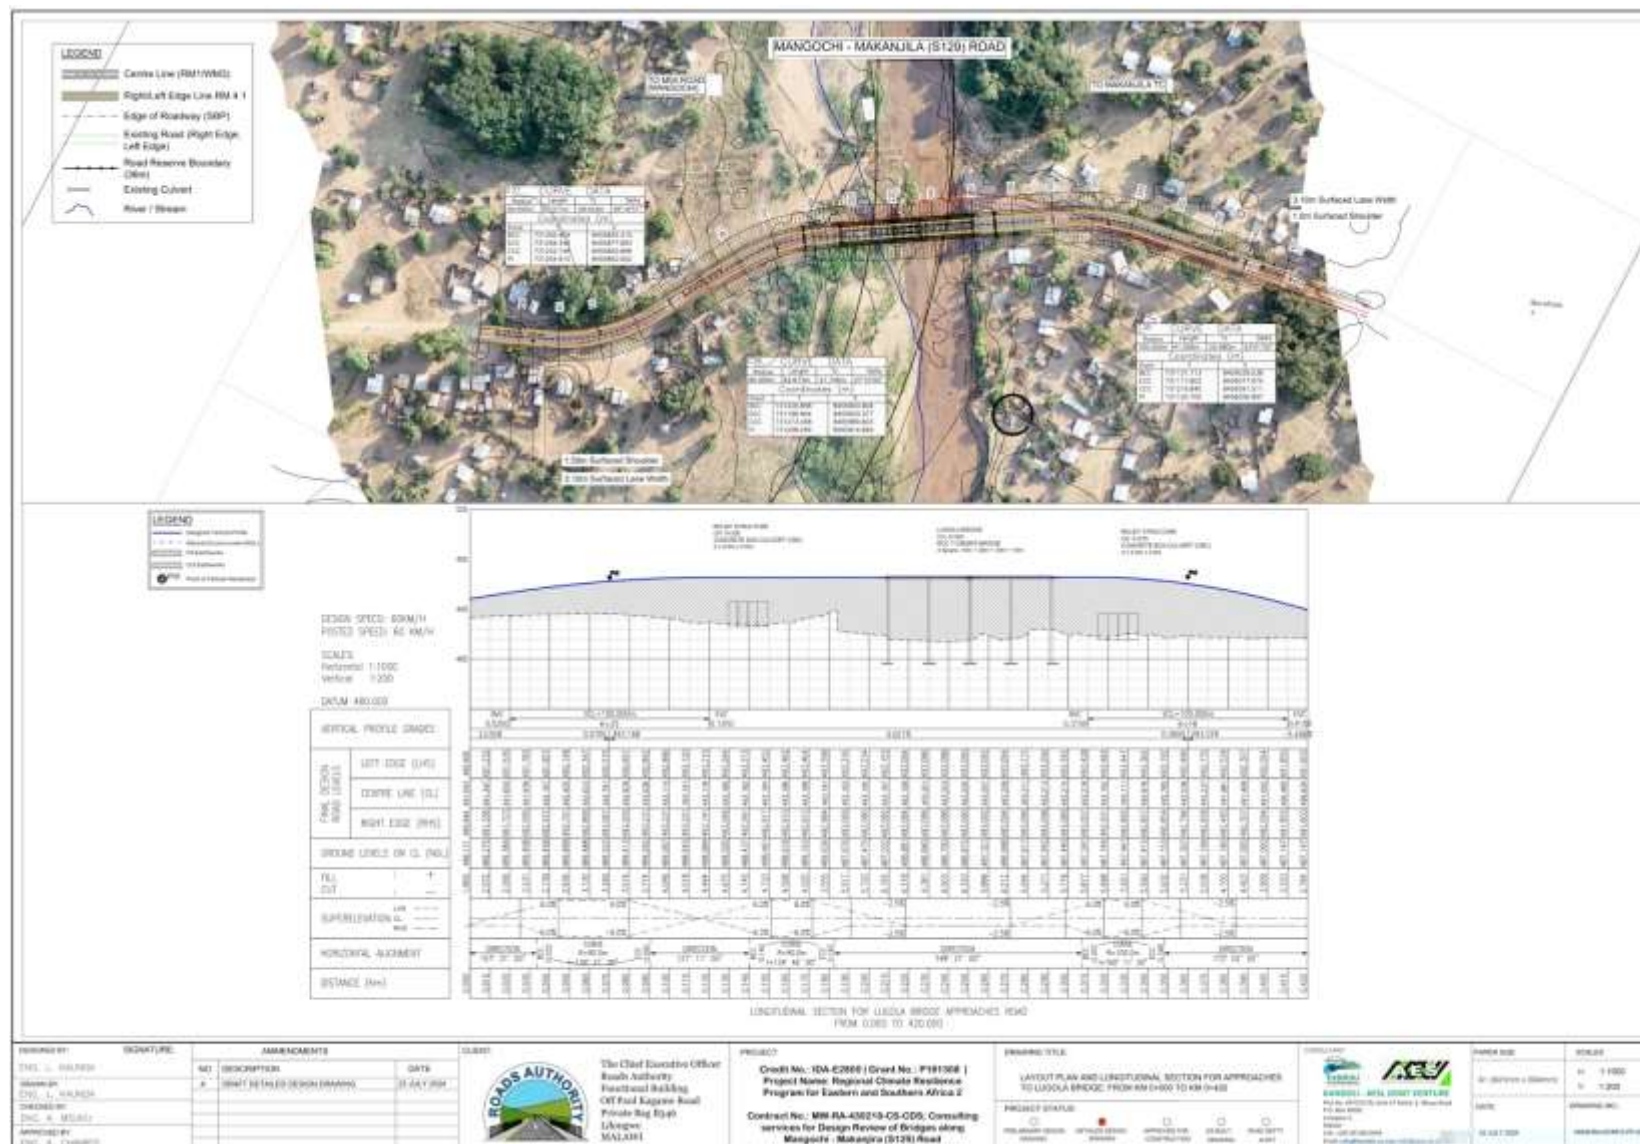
Lugola Bridge Layout Plan and Longitudinal Section for Road Approaches
